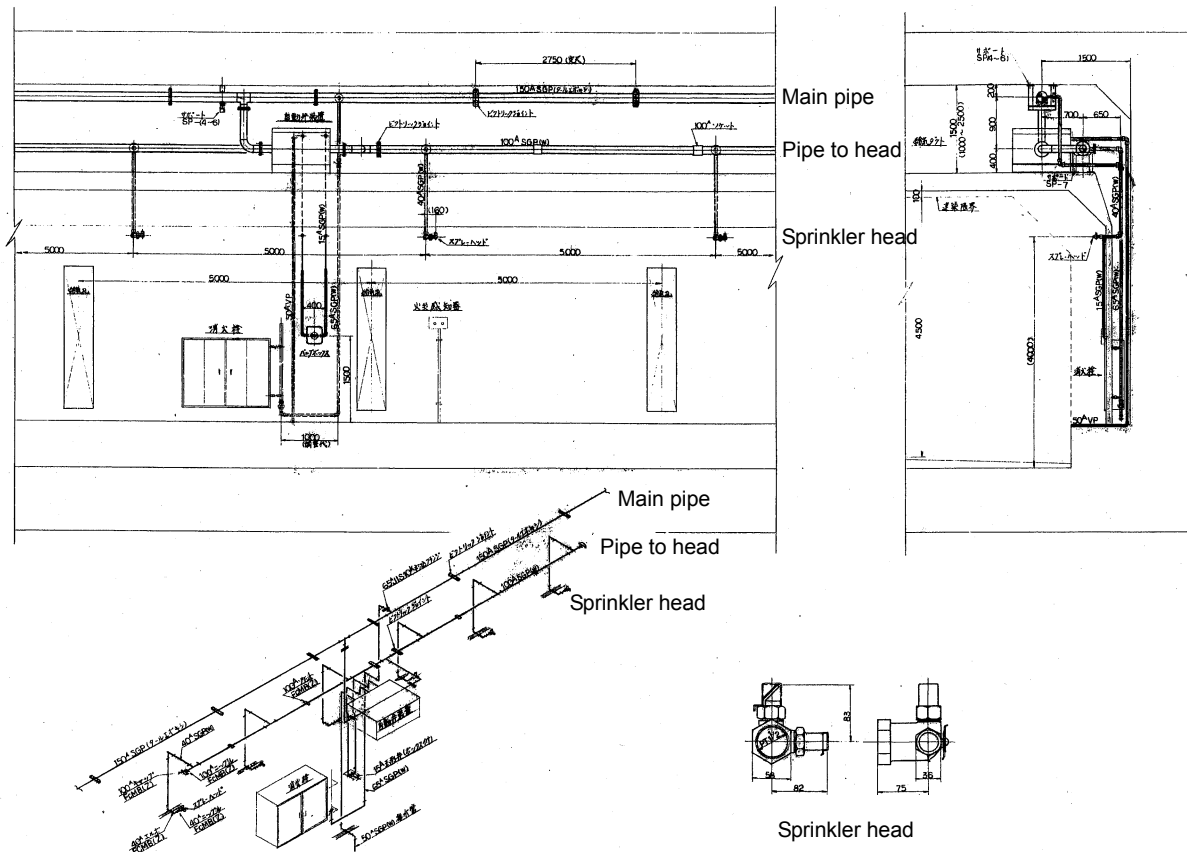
Example of sprinkler installation at corner between sidewall and ceiling (MEPC)
